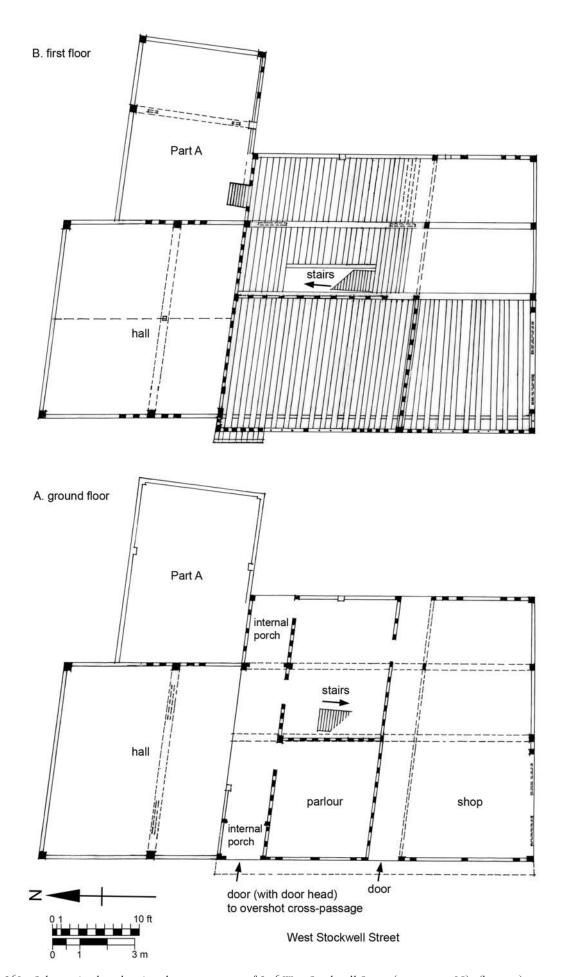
Schematic plan showing the components of 3—6 West Stockwell Street (corpus no. 98), (bottom) a. ground floor, (top) b. first floor
